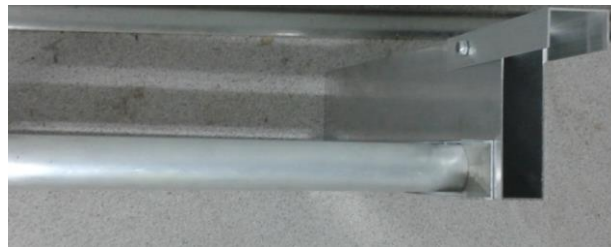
Plan view of the placement system attached to the structural slab of each floor
